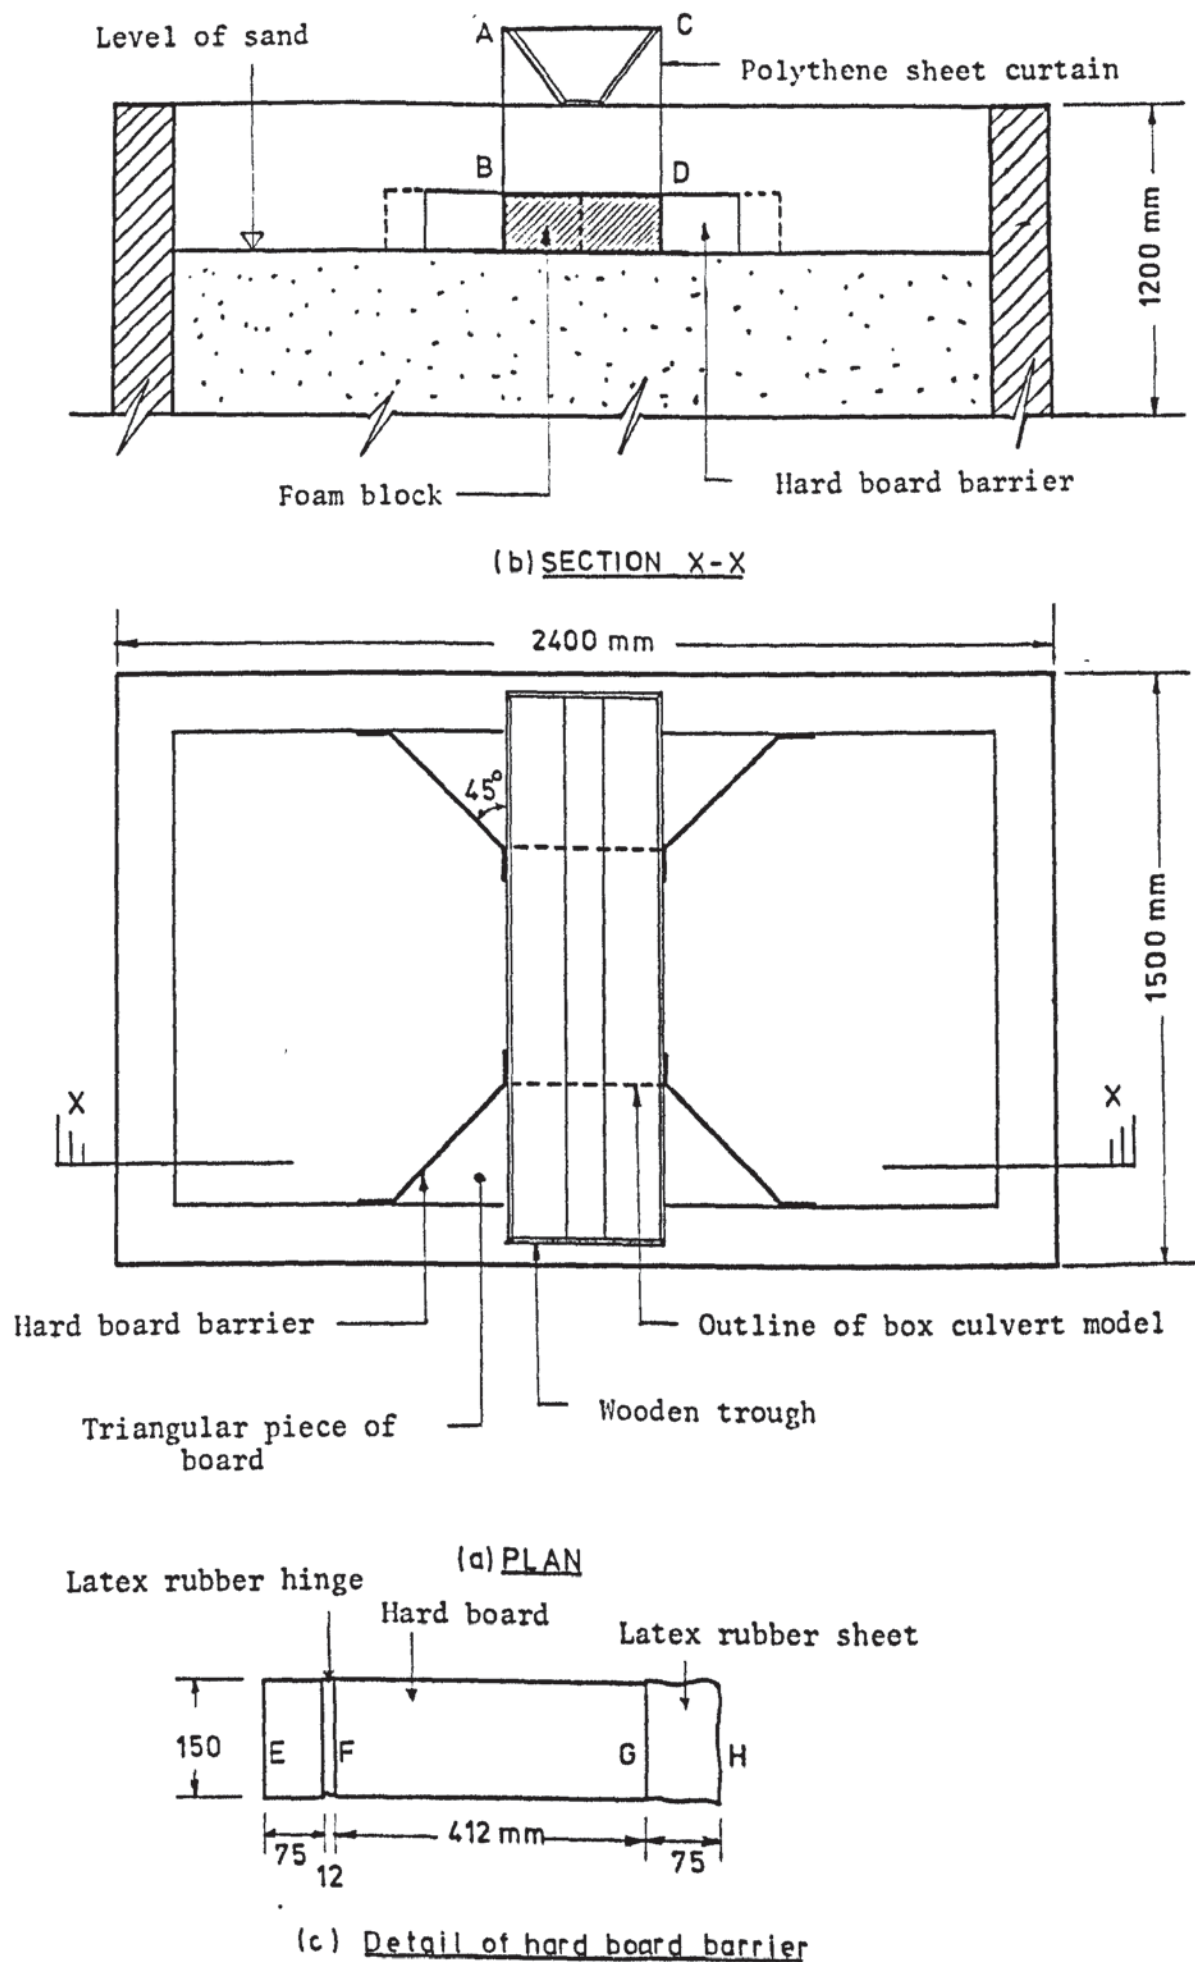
ARRANGEMENT FOR BURYING THE CULVERT IN SAND
